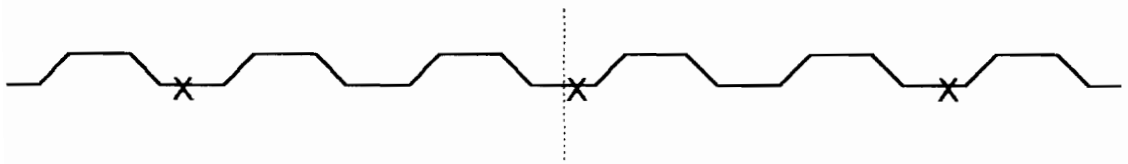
SDI-3/20-33-10 Concrete Strain Gage and Shear Stud Locations
